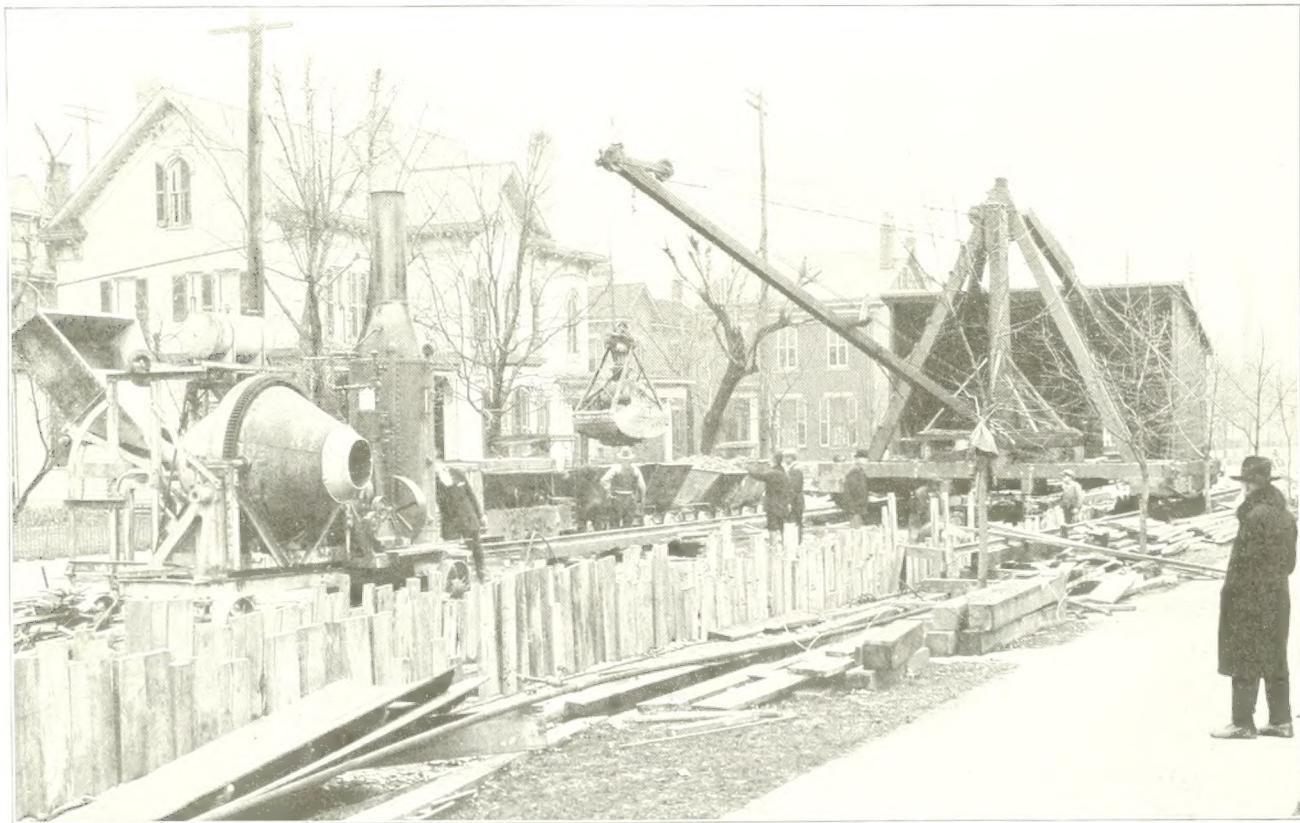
SEWER EQUIPMENT ON BUCKEYE STREET, HAMILTON
